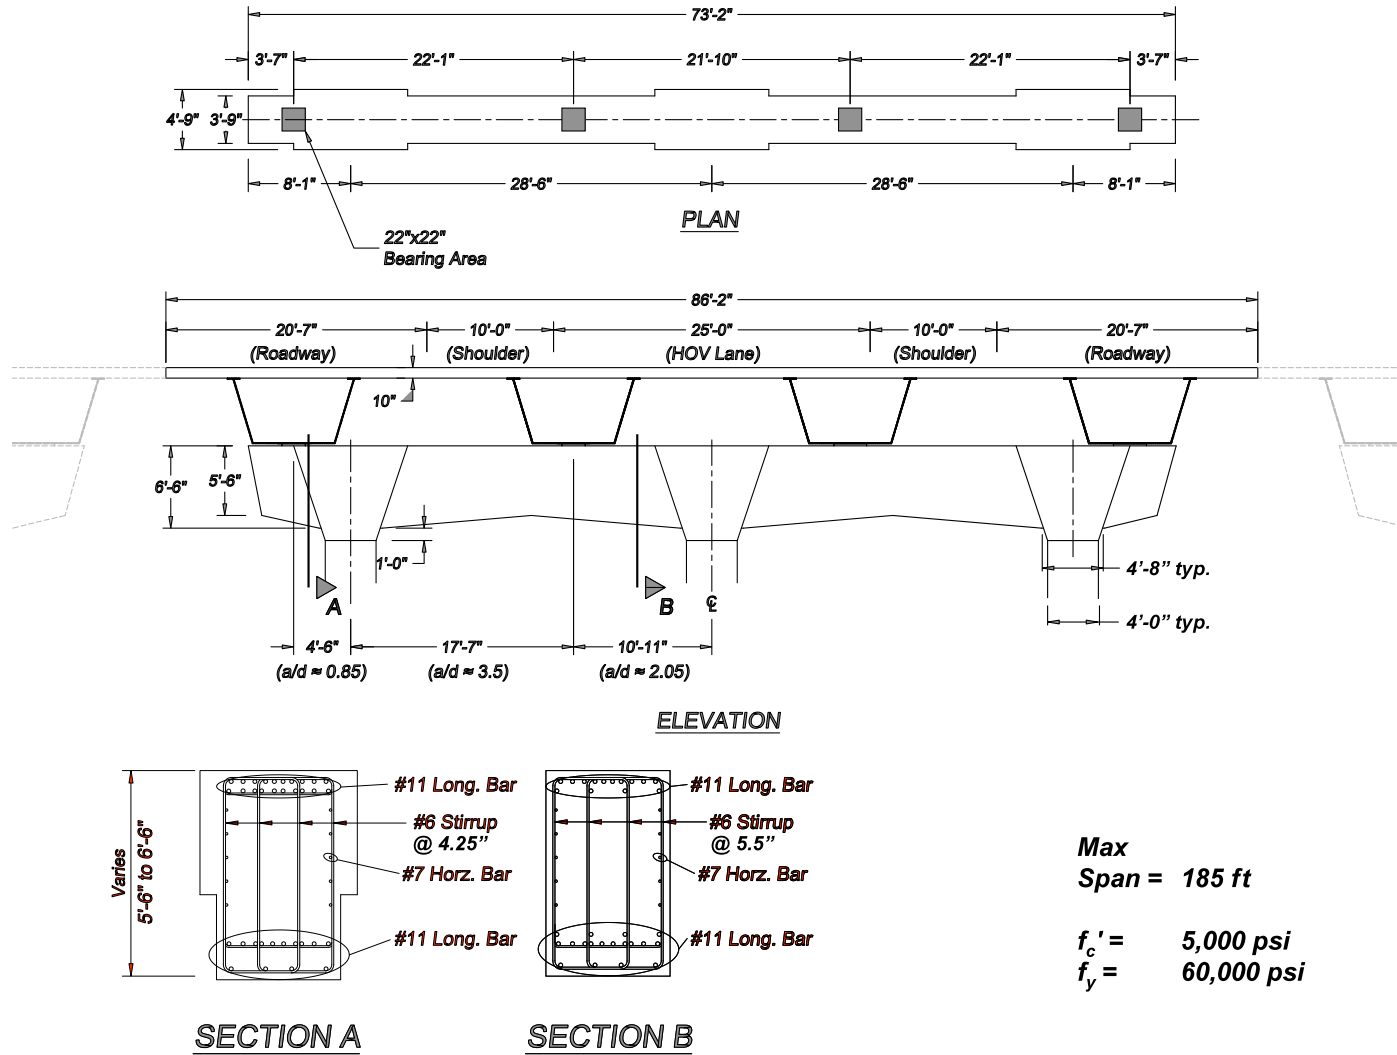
Preliminary plan; elevation; and cross-sectional details at critical shear regions.
